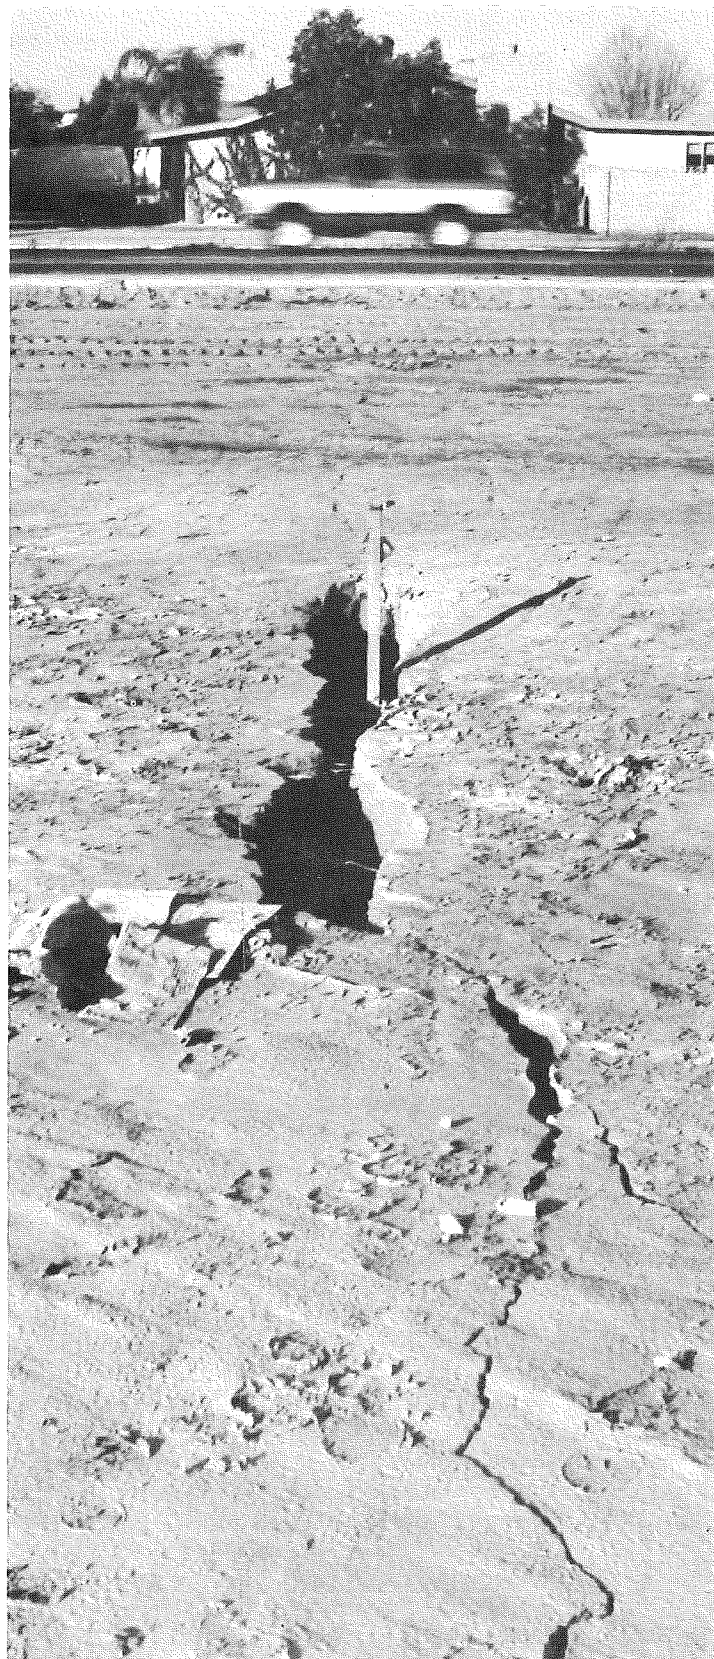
Earth crack in construction area at Lupine Avenue and 40th Street, Phoenix, Arizona. View is west toward 40th Street. Photo by Troy L. Péwé, No. 4484, January 27, 1980.
